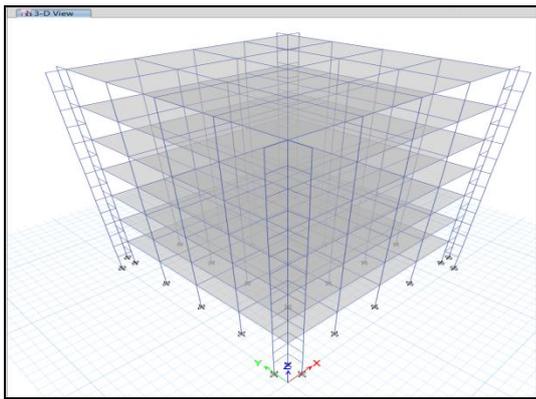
7 Storey RC Building with CFST LCF (7RC_CFLCF)
